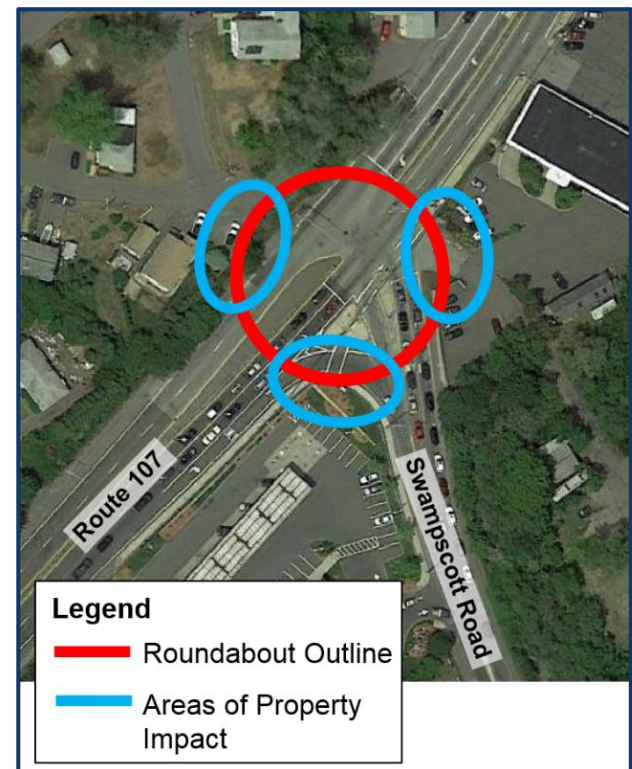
Swampscott Road/Dipietro Road Roundabout
